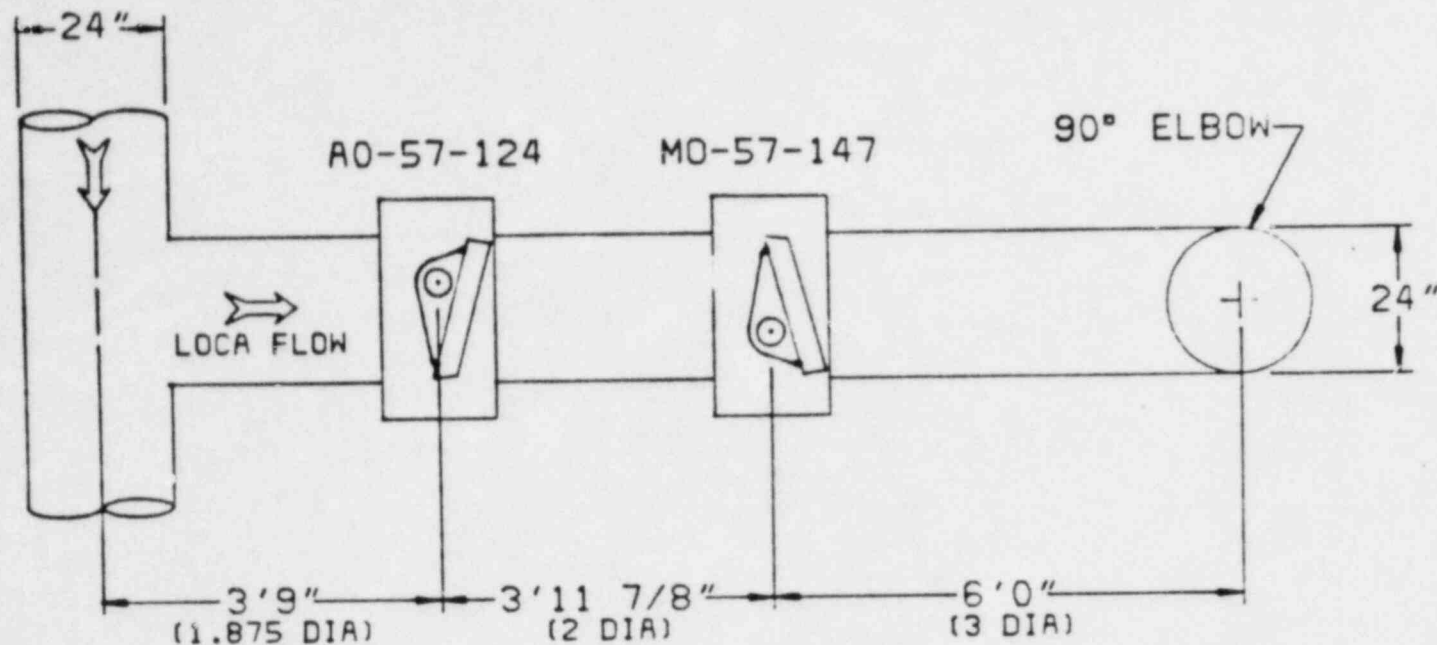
VALVES AO-57-124 & MO-57-147 AS INSTALLED
